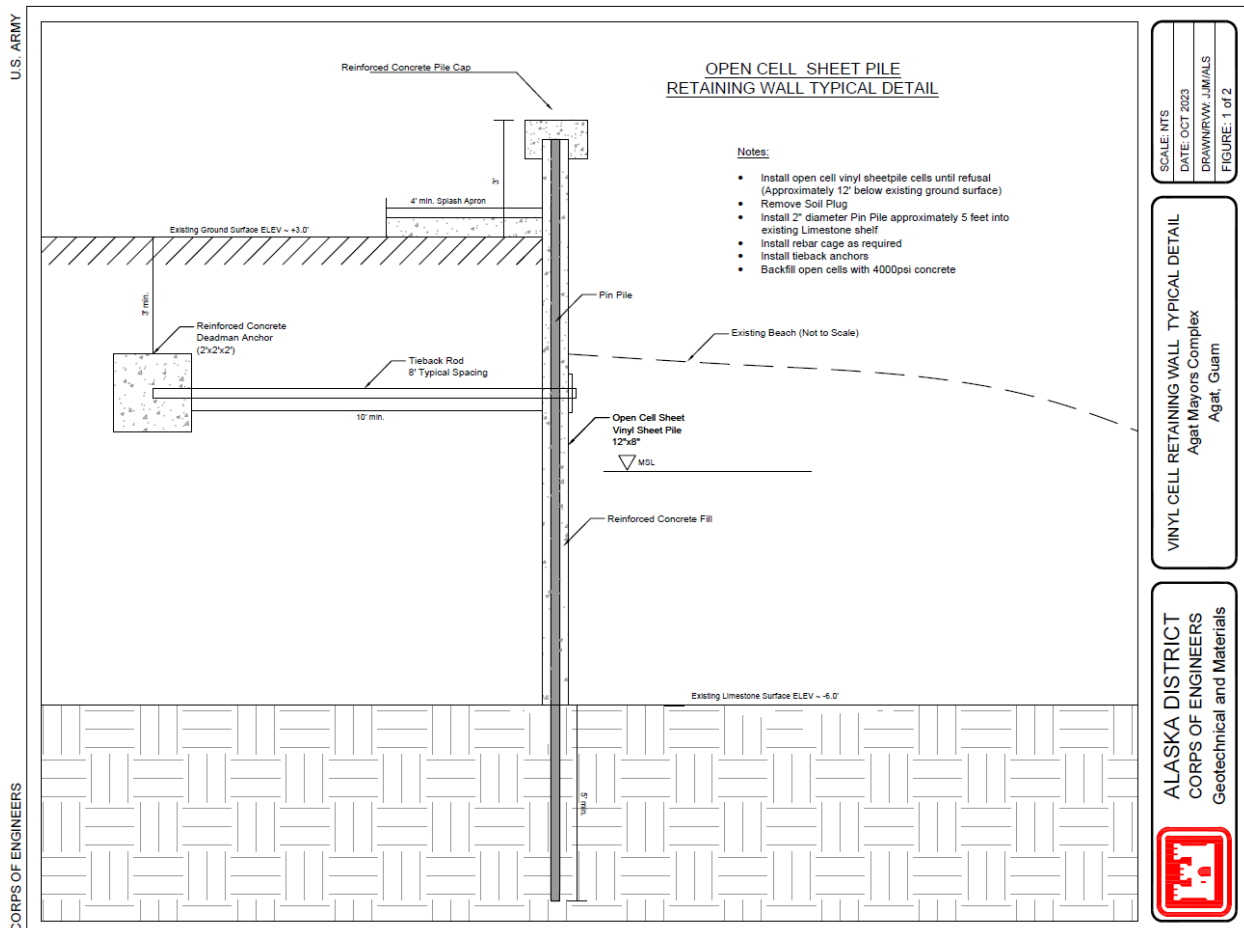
Preliminary Schematic of the Open Cell Piling Seawall
